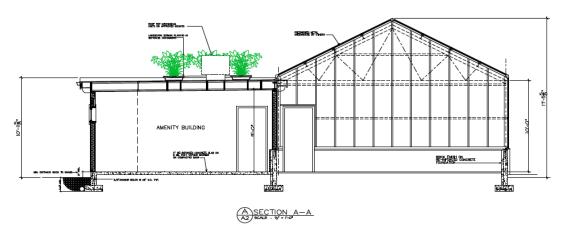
Cross section of the south elevation of the proposed Greenhouse and attached amenity building.
